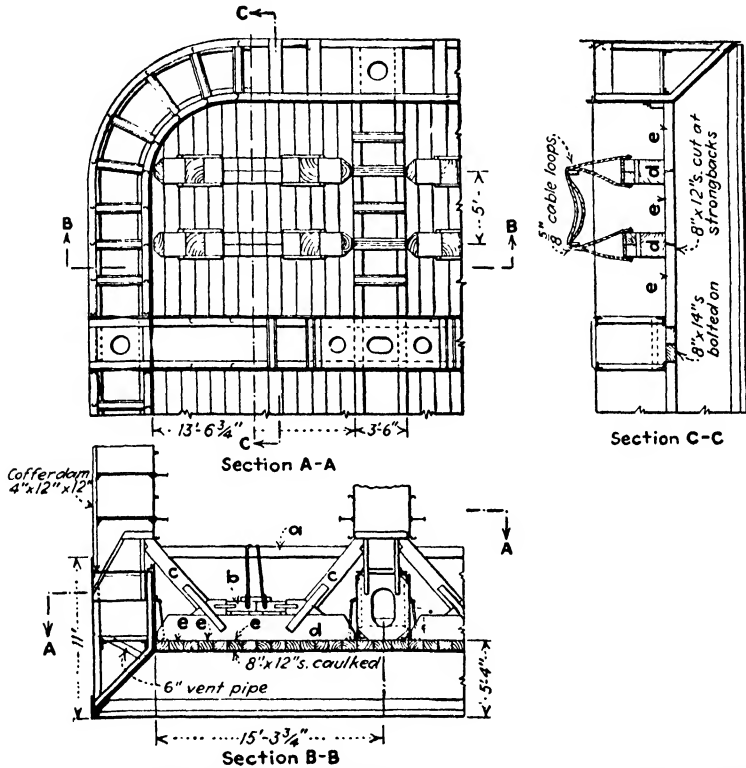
Showing False Bottom of Caisson Used on the San Francisco-Oakland Bridge.
